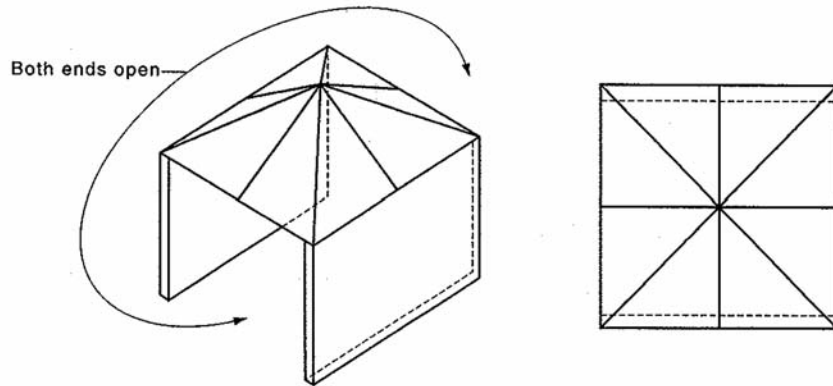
OUTDOOR AREA - EXAMPLE 4
